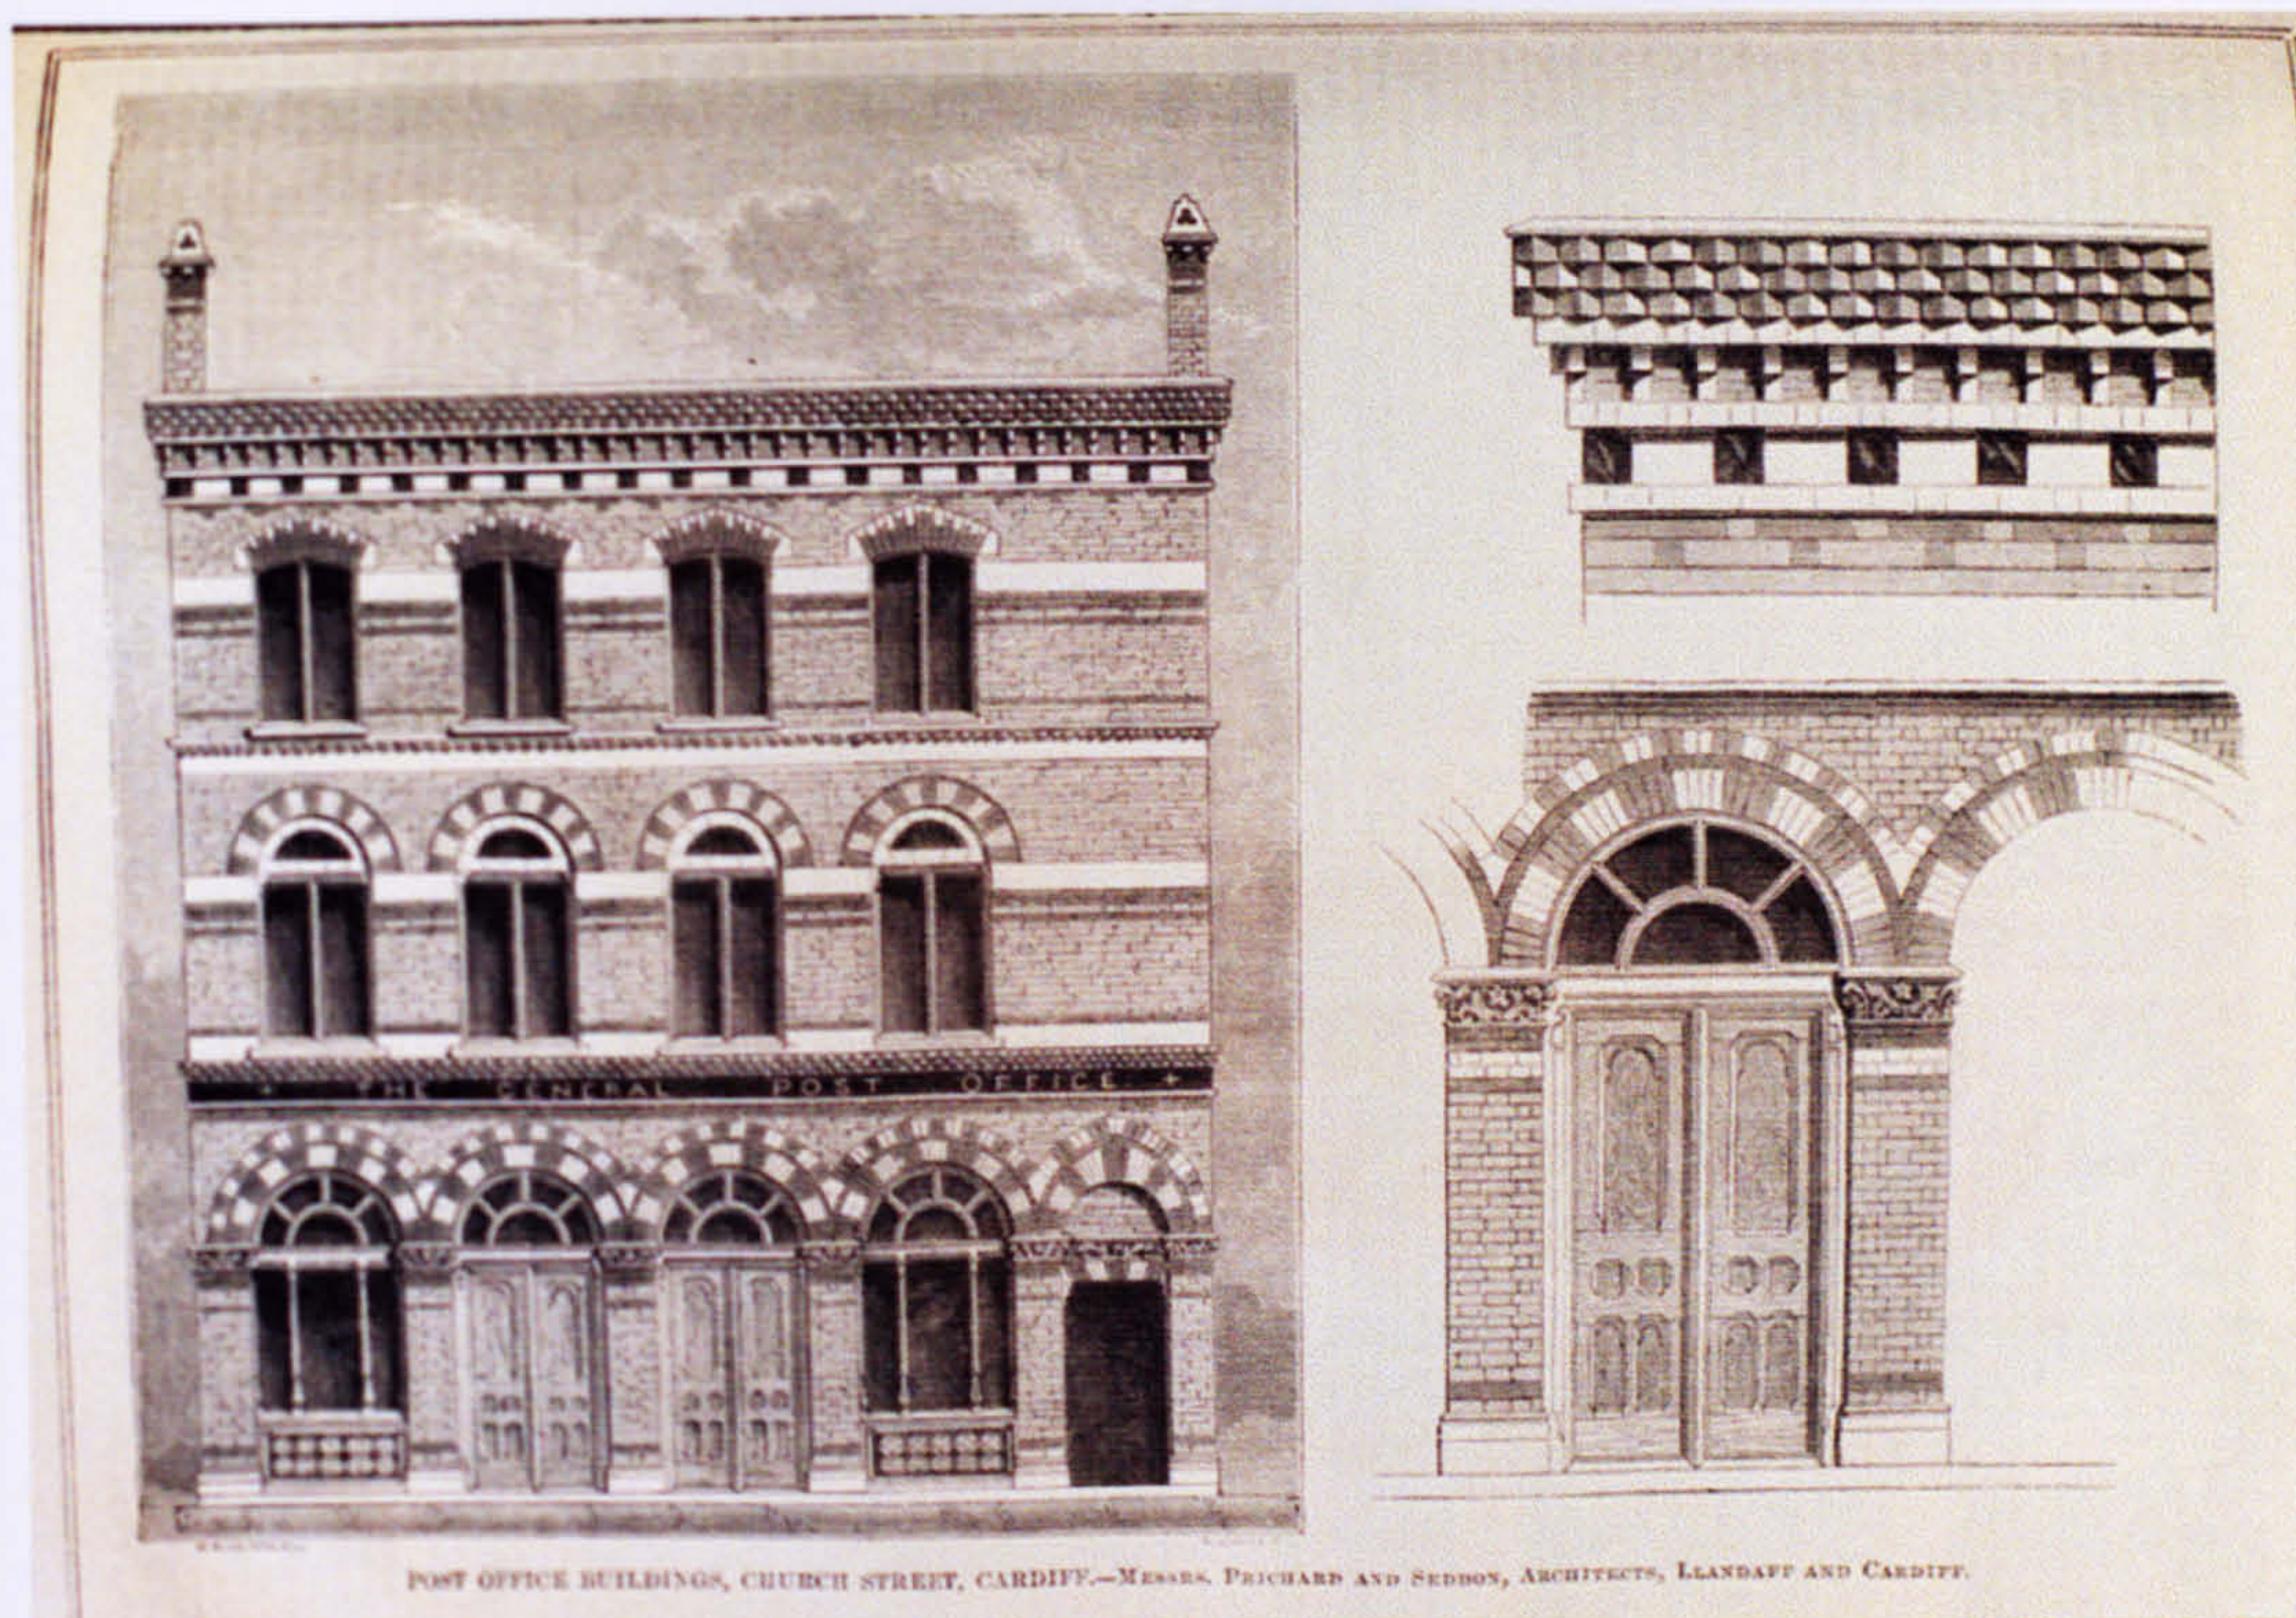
Post Office buildings, Cardiff. (*The Building News*)
